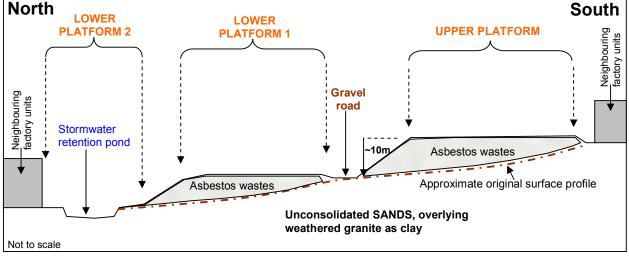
SCHEMATIC CROSS-SECTION A – B SHOWING THE PLATFORMS
